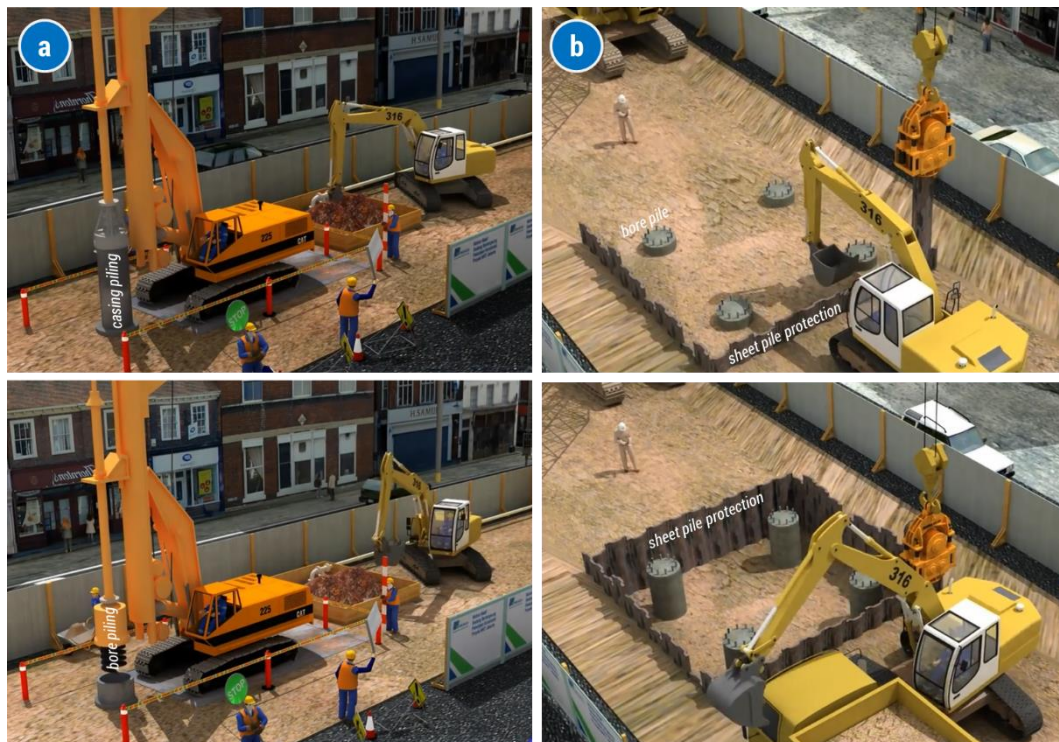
Illustration of Earthwork in Making Pier Foundations
